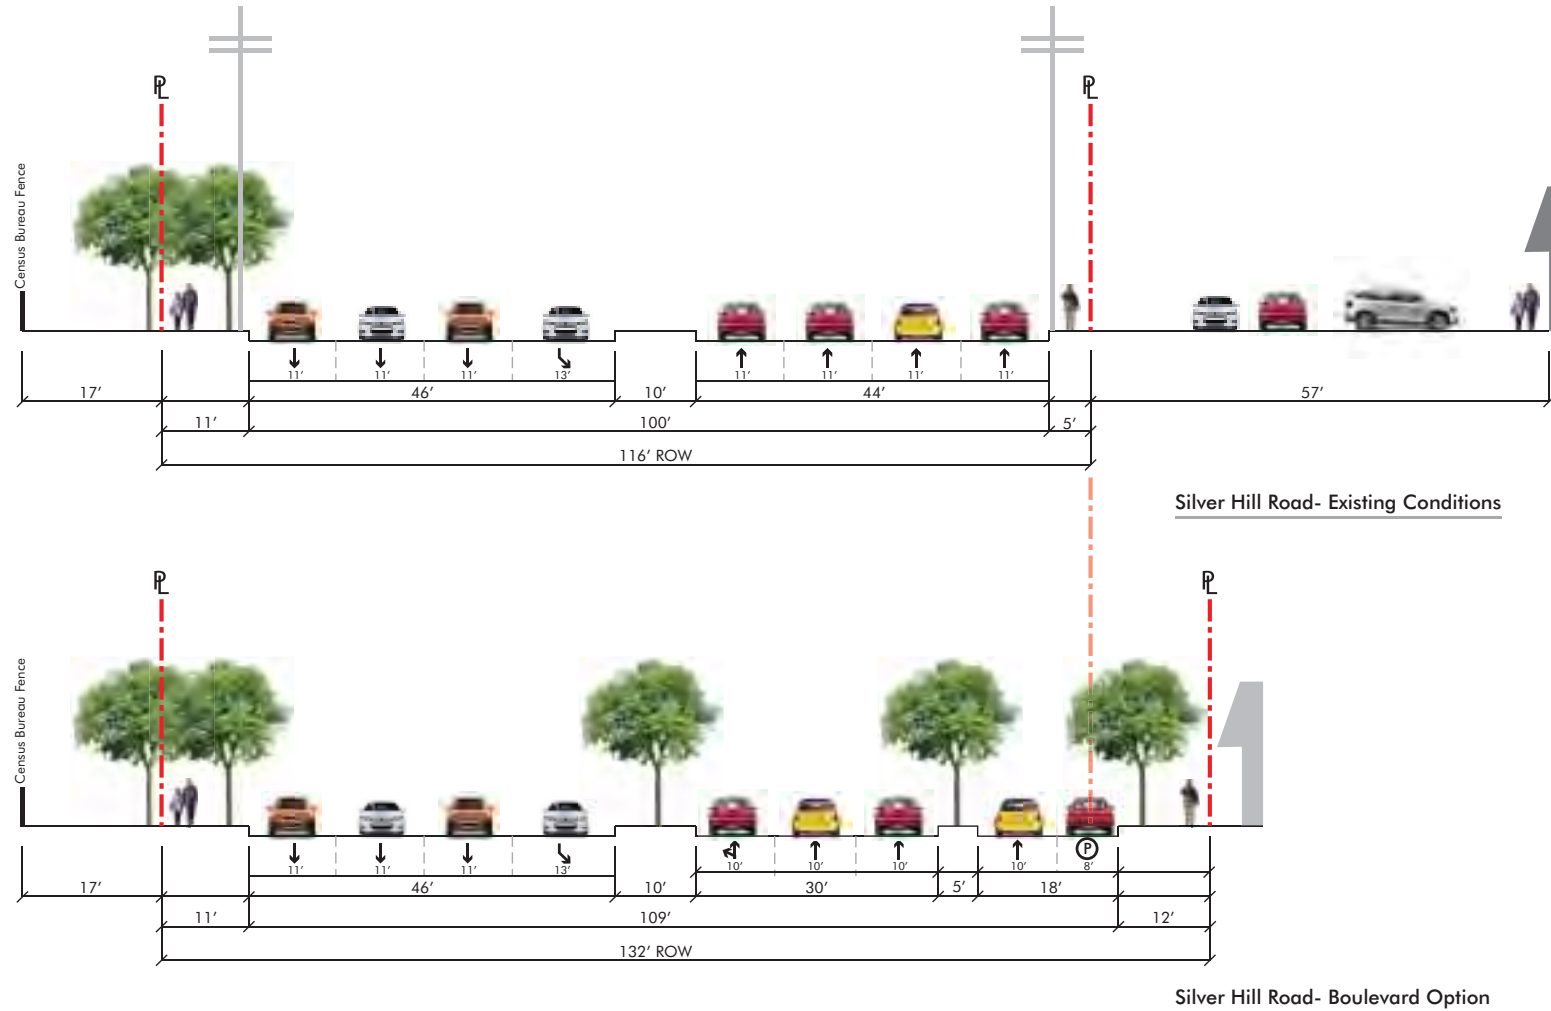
Silver Hill Road Multiway Boulevard Concept Section
